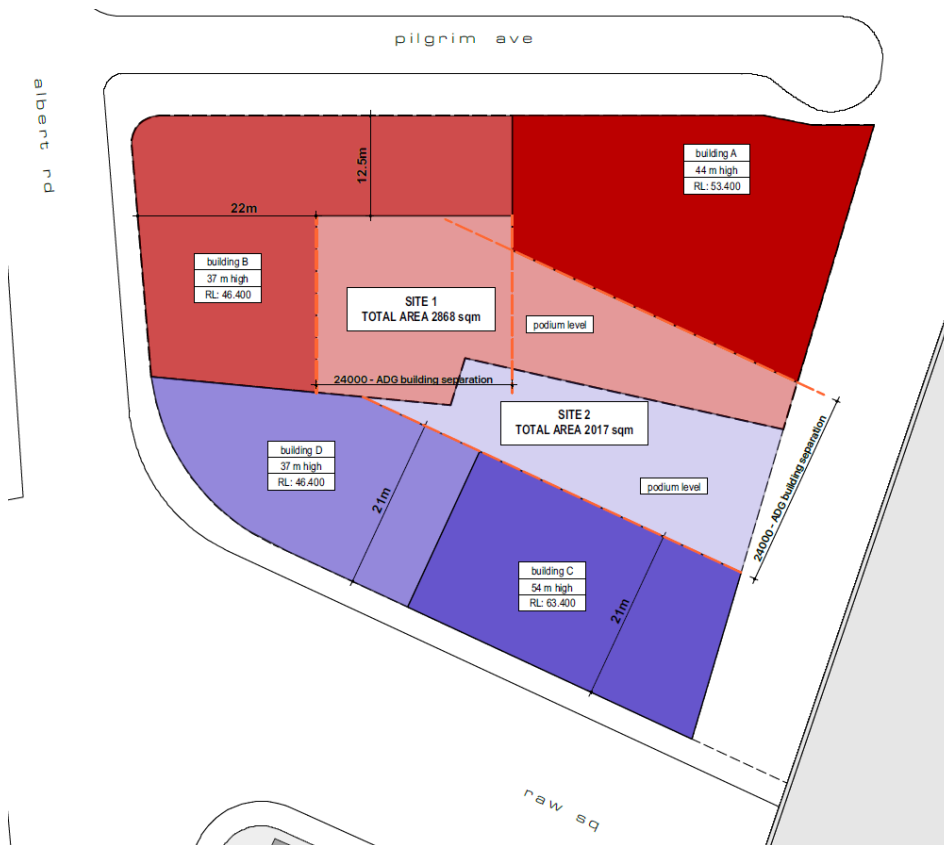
Indicative layout scheme of the subject site and adjoining site
